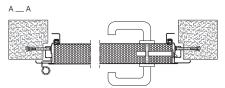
Horizontal cross-section of ECO external seamless steel door with a corner frame without a thermal break
